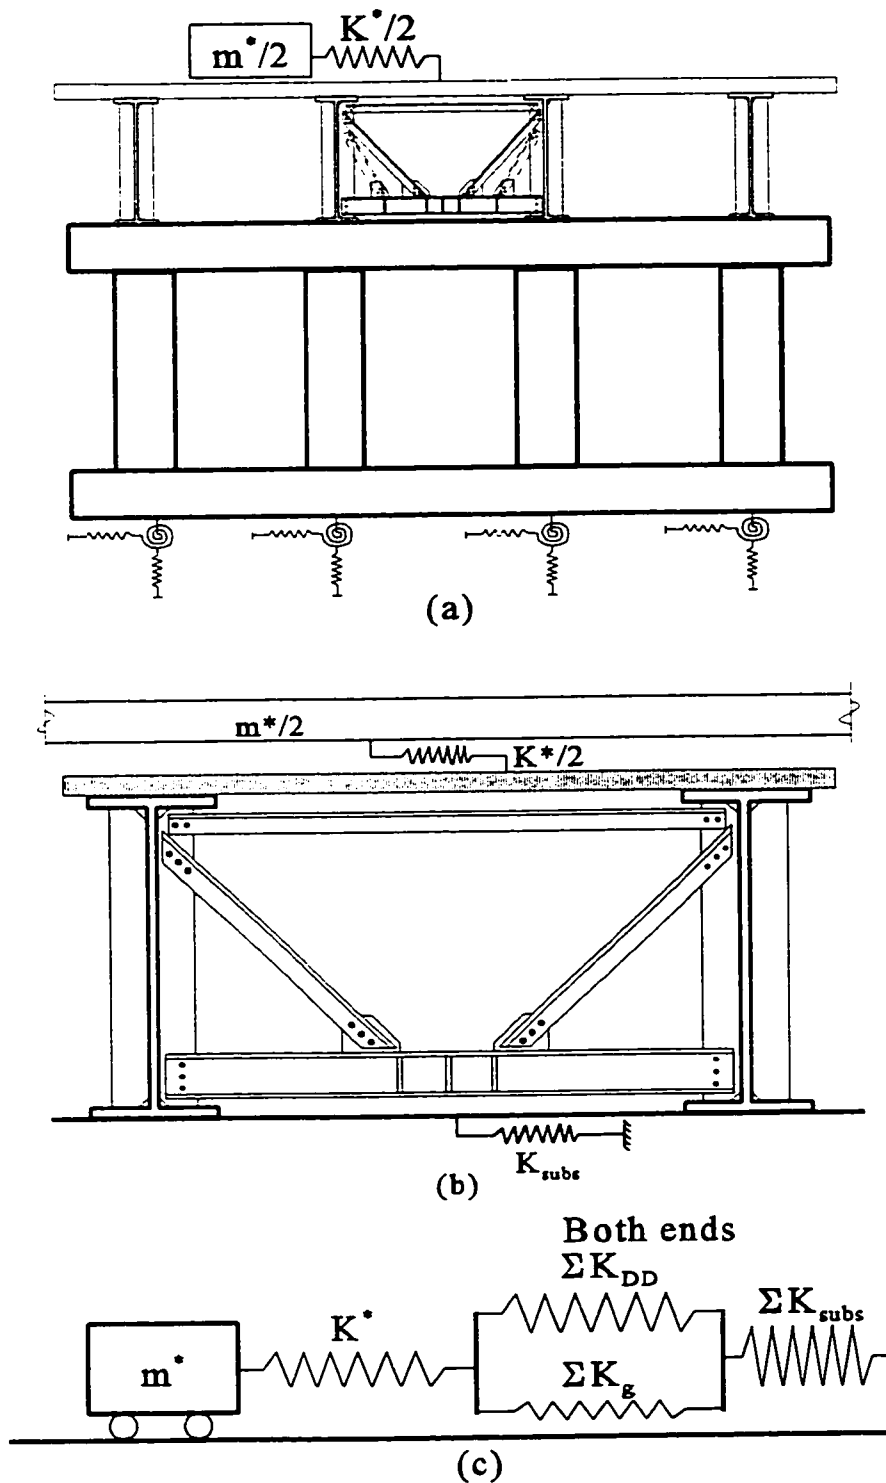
Spring modeling: (a) schematic of a typical bridge supported by a substructure including piers and foundations; (b) spring modeling of the bridge in the transverse direction at one end; (c) simple spring model of the dual system in entire bridge superstructure.
